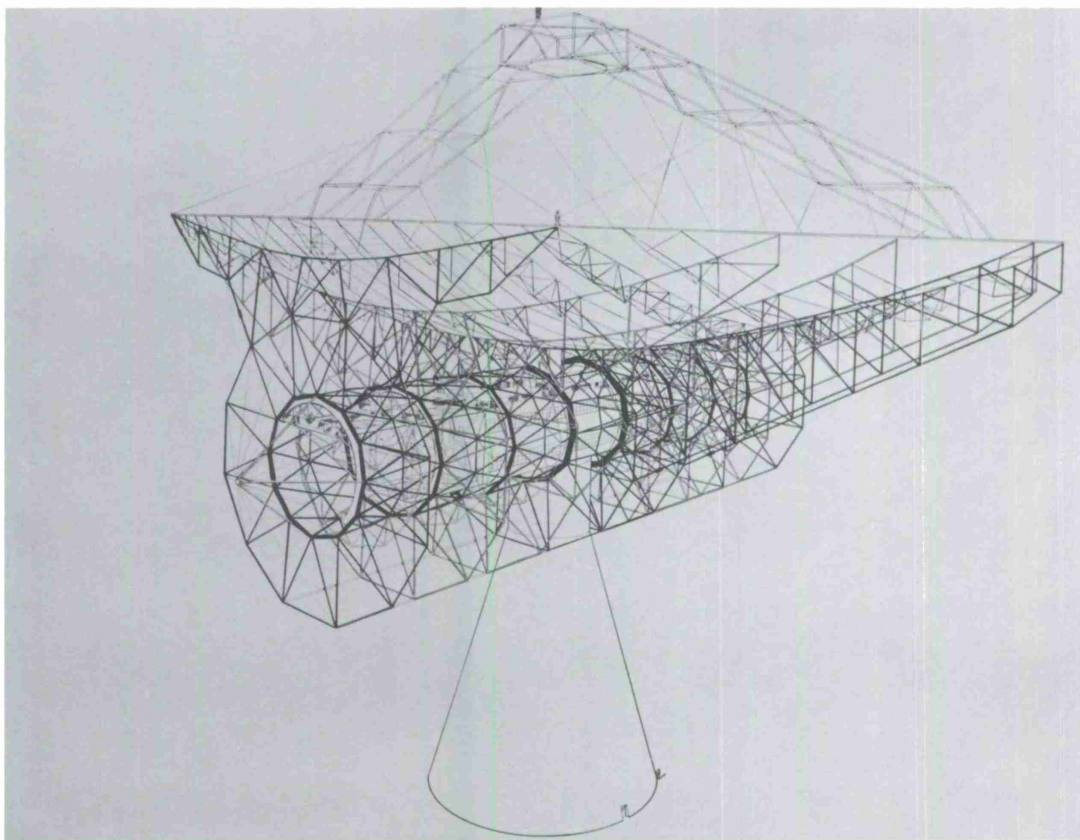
Torque tube (heavy outline) shown with completed Hammerhead antenna.
